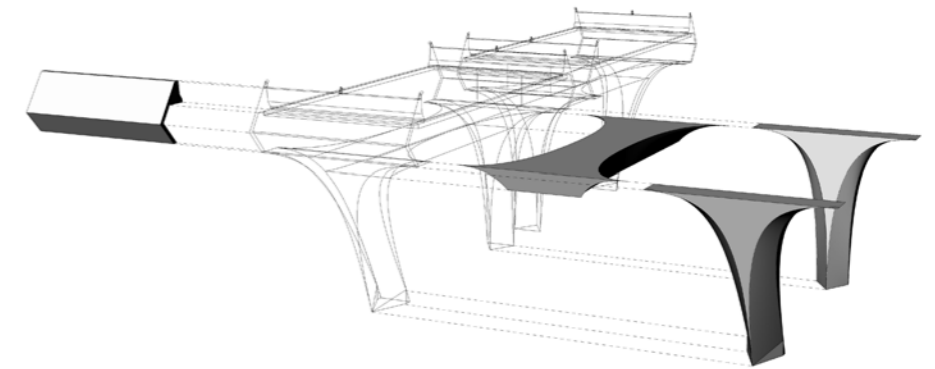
By considering the main elements of a concrete bridge that can be manipulated the barrier, cross head and pier present opportunities to be seen as one united form
